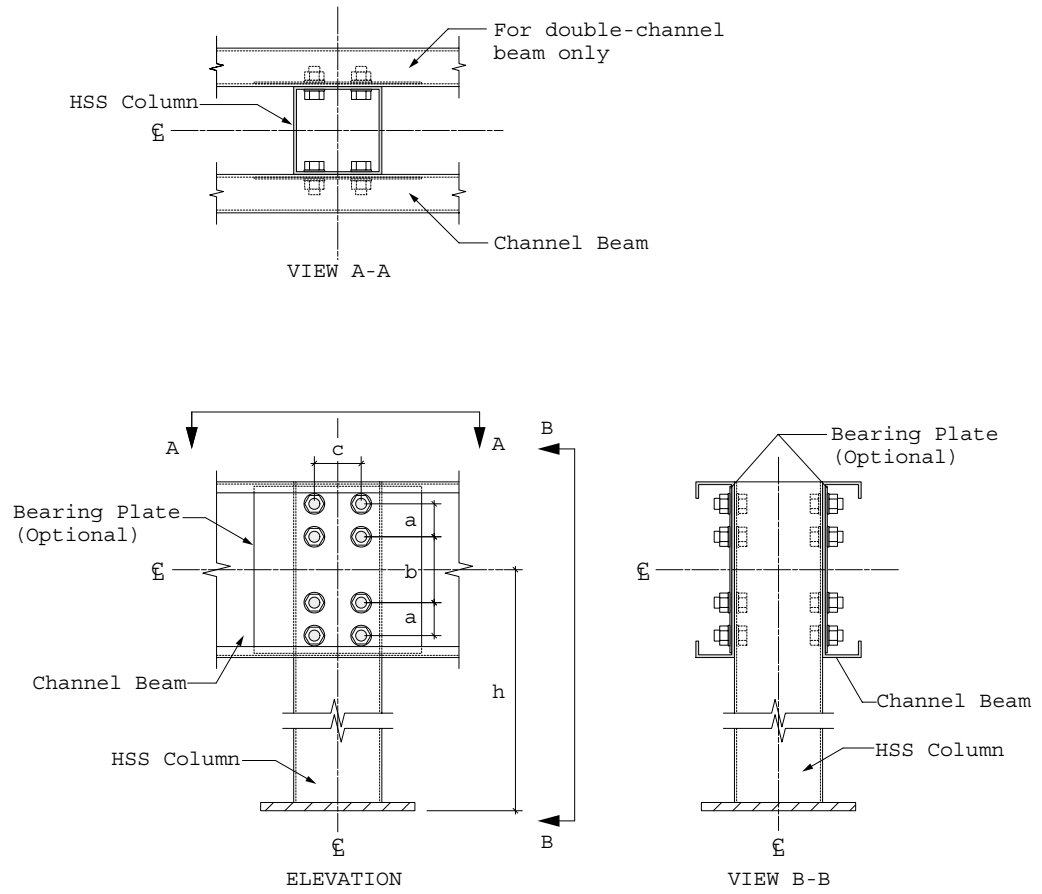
TYPICAL CONNECTION OF CFS-SBMF
